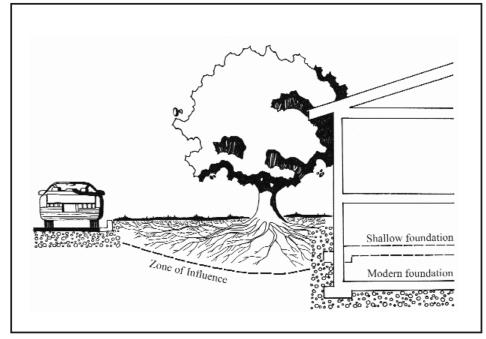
Relationship between a mature tree and building foundation where tree was planted close to building.
